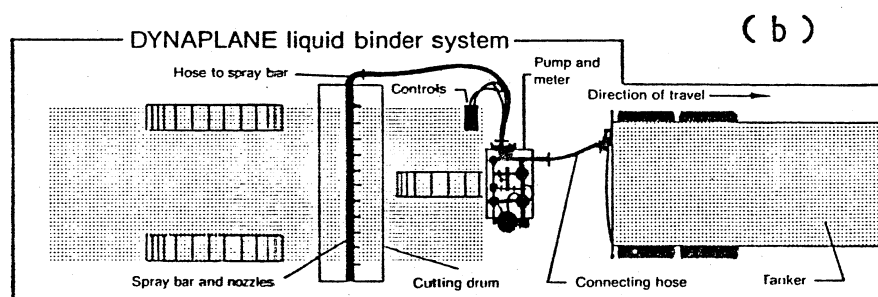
6.- COLD MILLING EQUIPMENT:
